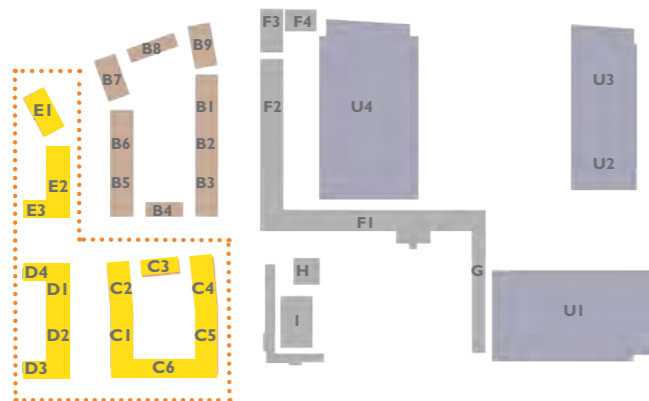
Key Plan - Location of Block C, D and E
